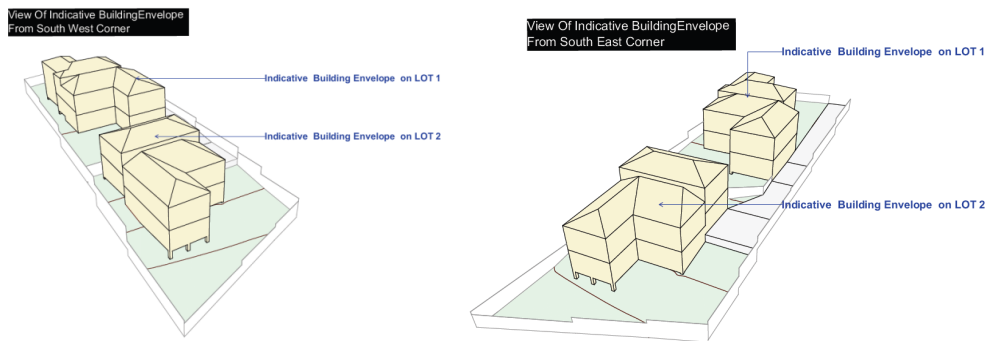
Extract of Indicative Building Envelope (DA-005) plan
